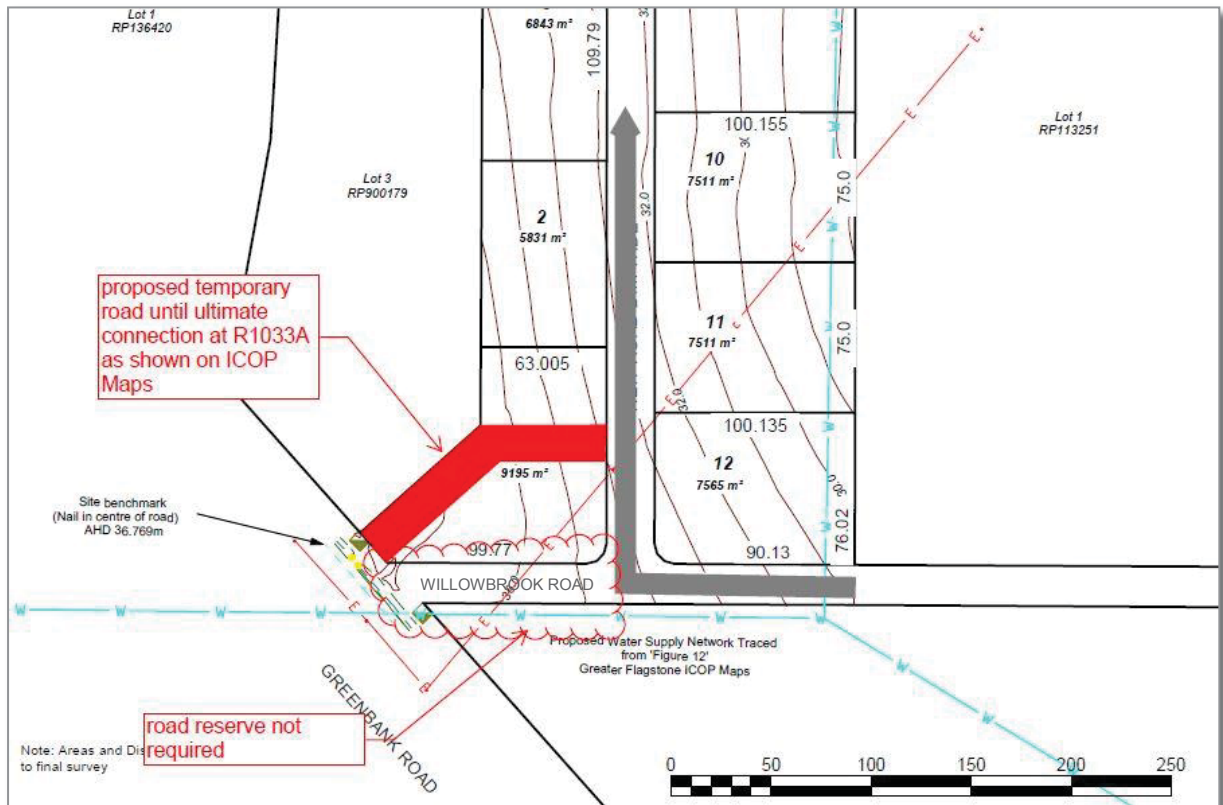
NORTH MACLEAN PDA ROAD LAYOUT
